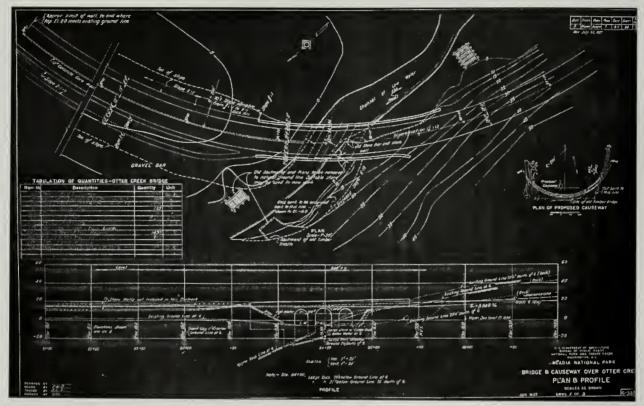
Plan and elevation of the causeway and bridge at Otter Cove, 1937. (U.S. Department of Agriculture, Bureau of Public Roads, Project 7A1, Sheet 24 of 79, 1937)
